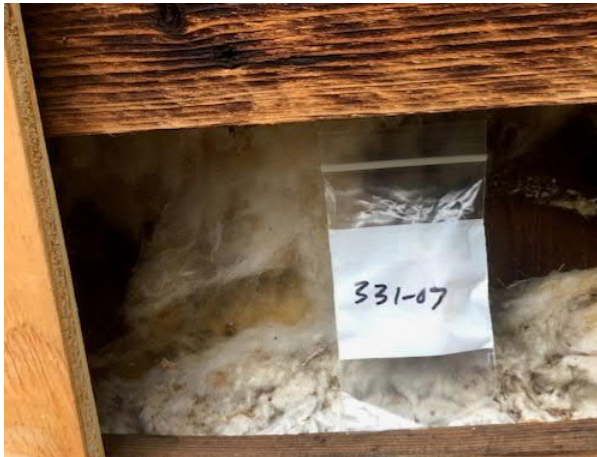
Sample 331-07. White fiberglass insulation; south shed – not asbestos-containing.
